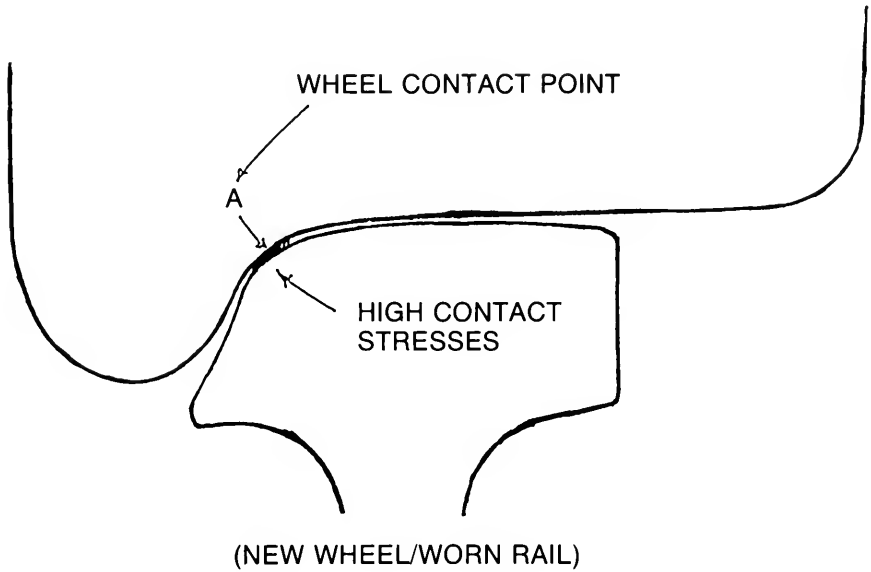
Single Point Contact between Gauge Corner of Rail and Wheel Flange Throat.
